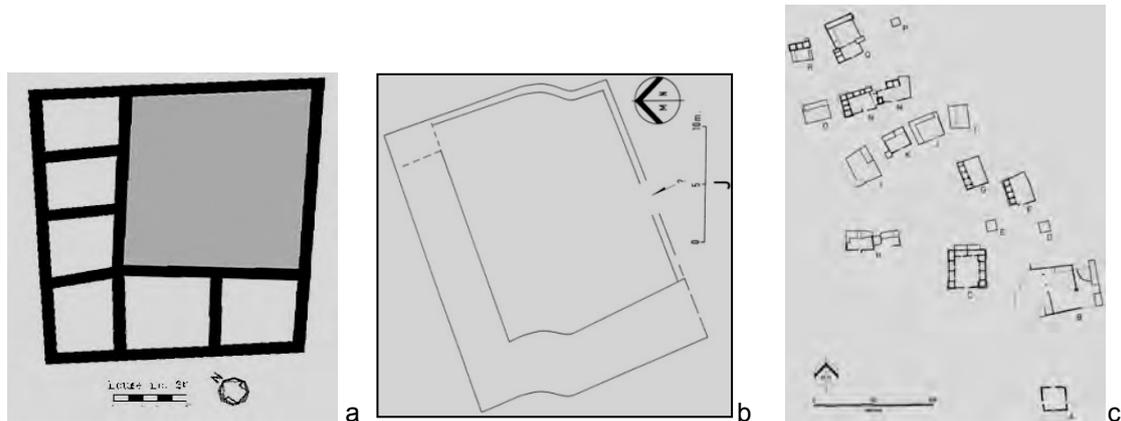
(a) plan of house no.(20) at al-Hallabat, (b) restoration plan of structure J at ar-Risha (After Helms, 1990: 115, Fig. 55), (c) site plan of structures at ar-Risha (Source: After Helms, 1990: 129, Fig. 71 and 129).
